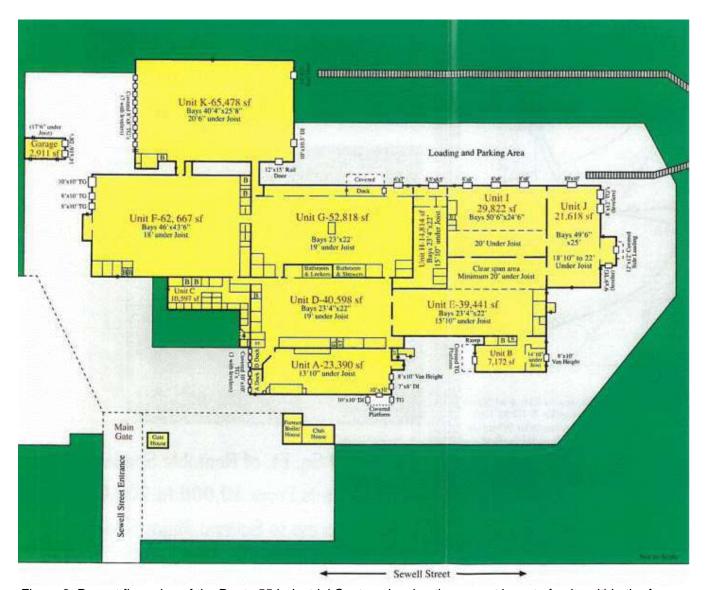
Recent floor plan of the Route 55 Industrial Center, showing the current layout of units within the former plant. The garage (top left) remains extant, but the gate house, former boiler house, and club house shown at the bottom of this image are no longer present. The extant railroad siding is shown at top right. The extant fire pump house, water tank, and utility meter building are not shown. Note this plan is oriented with Sewell Street at the bottom (Source: Industrial Investments, Inc. website, accessed May 27, 2014).
